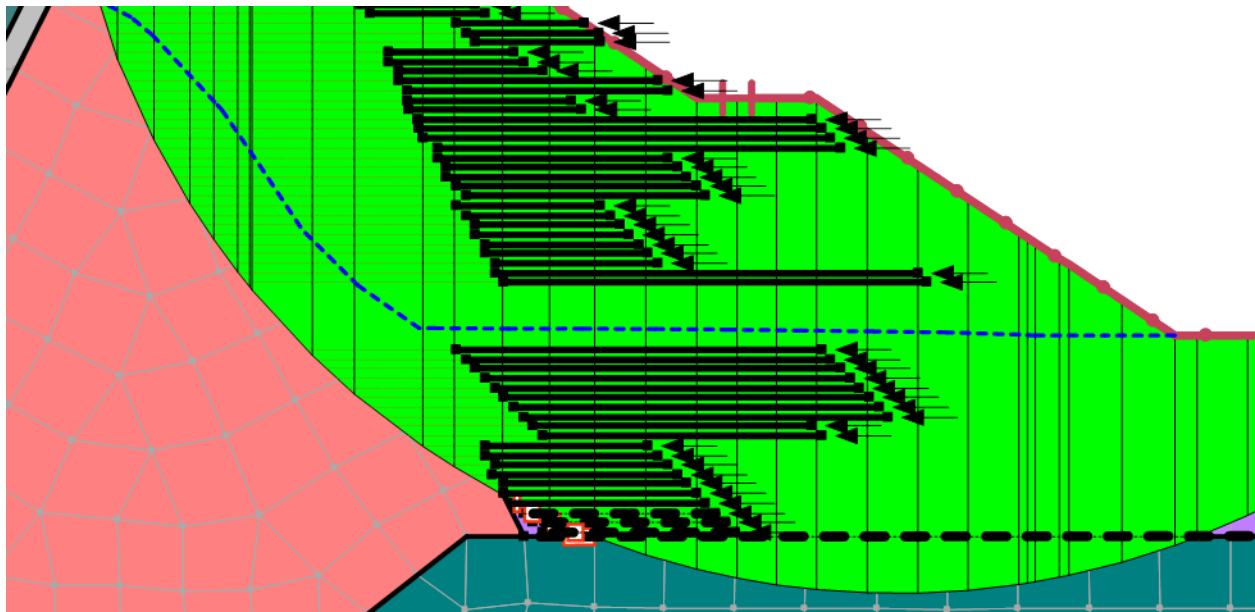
Detail E; shows the intersection between critical failure surface and reinforcement (1.5H: 1V)
